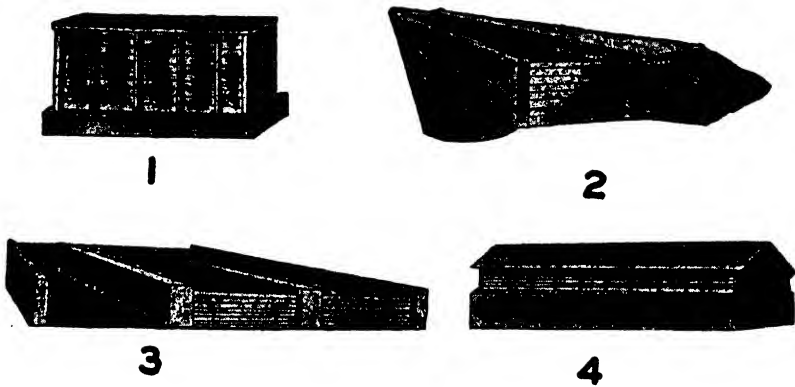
Types of compost pits. 1. Wooden pit with concrete floor, constructed above the ground. 2. Concrete pit with removable end wall, constructed on a side hill. 3. Three compartment pit of concrete framework and removable wooden end walls. 4. Two compartment concrete pit with a roof and removable wooden walls.
